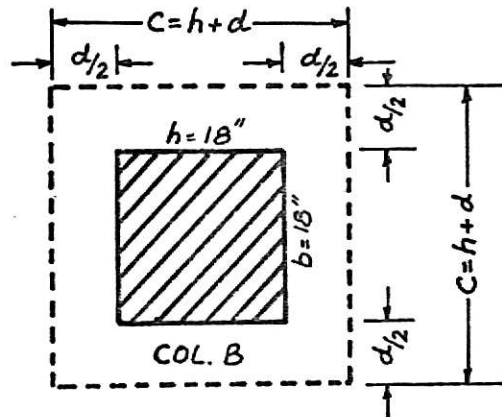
TOP PLAN AT COLUMN B, METHOD II.
